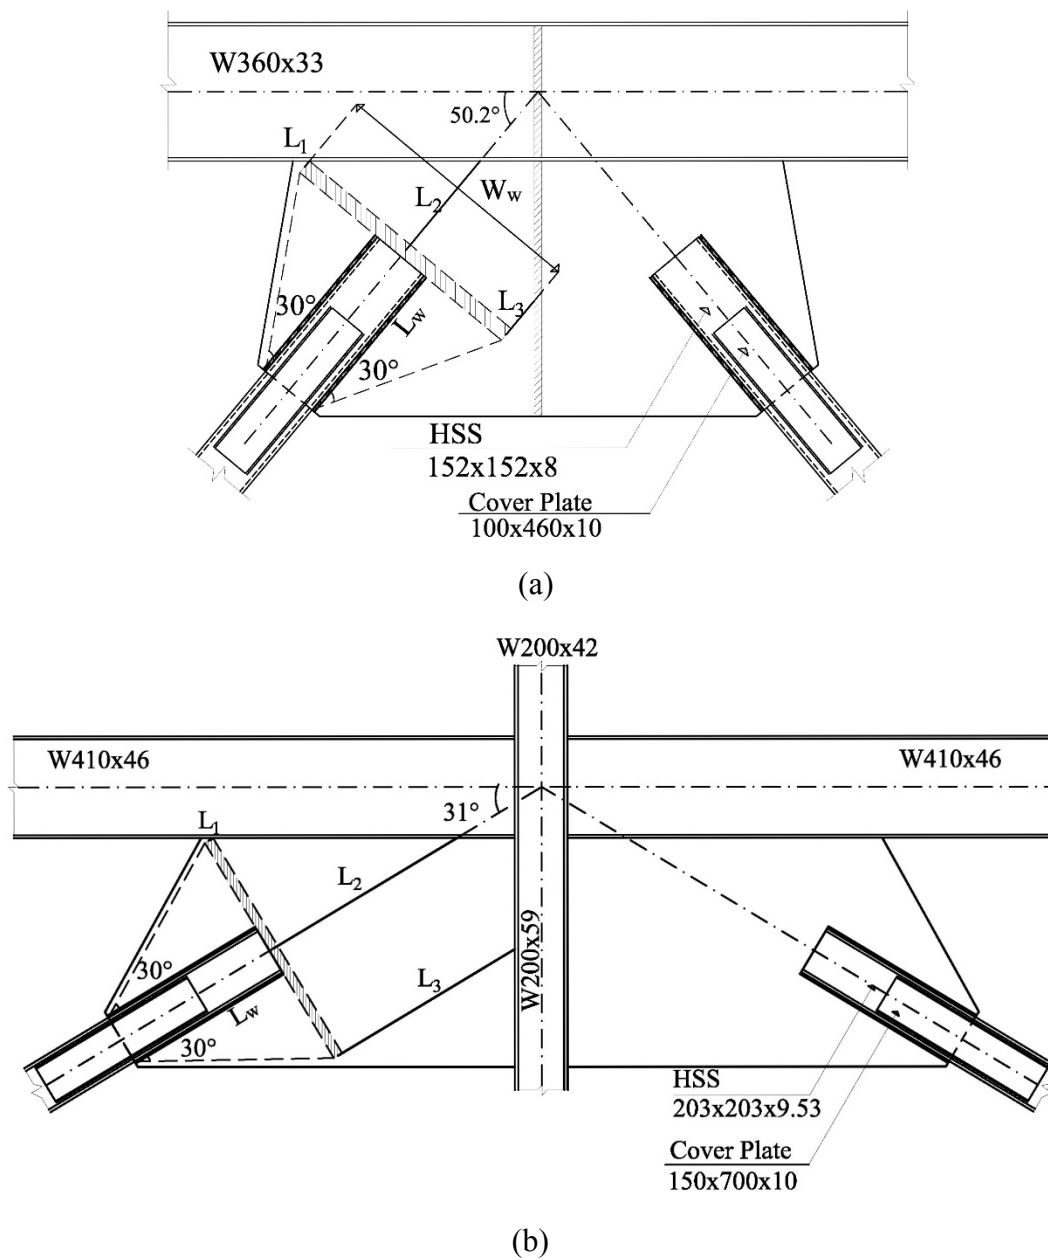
Middle brace-to-frame connection detail at ground floor according to CSA/S16-09 (post-retrofit connection of 3-storey CBF, Quebec City): a) E-W direction; b) N-S direction
